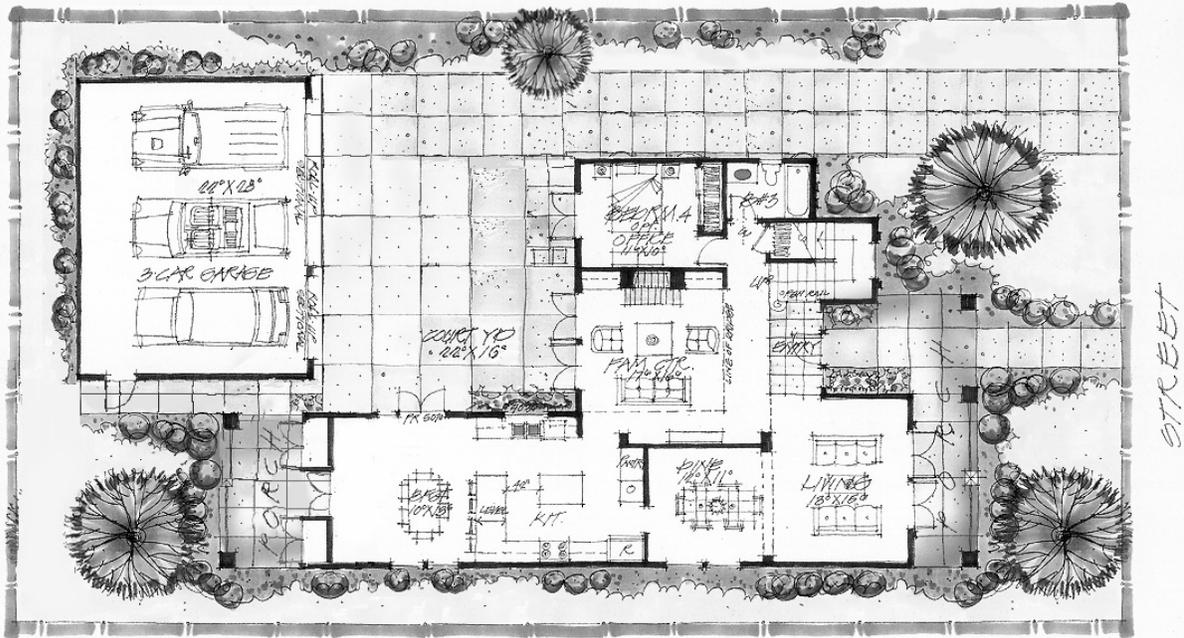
Southern California House Prototype with Street Access First Floor Plan
